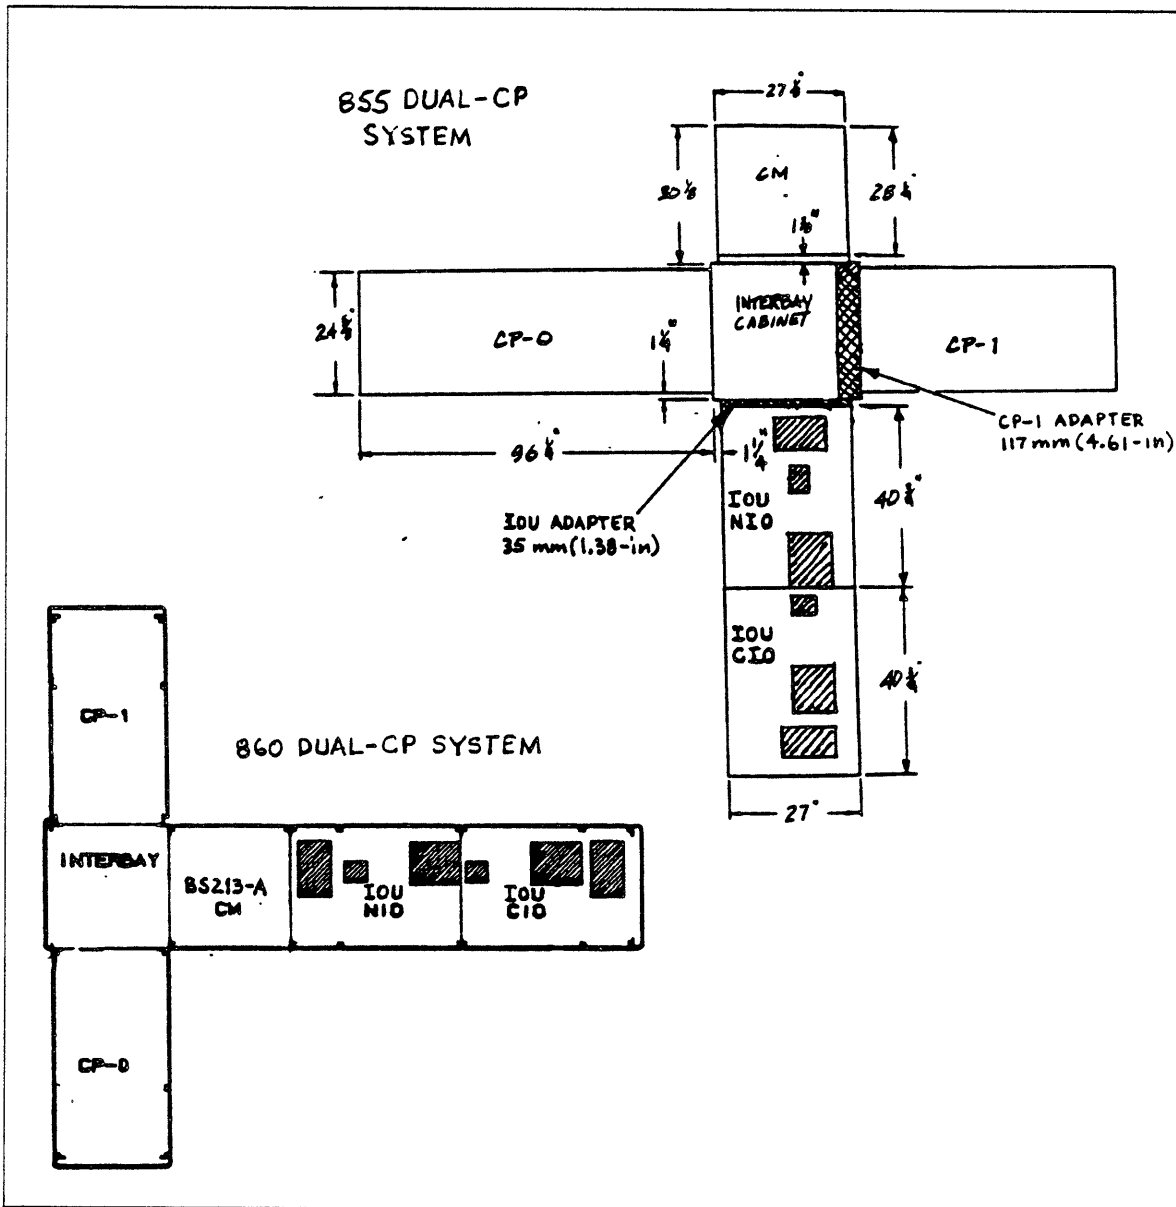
IOU NIO and CIO Floor Cutout Locations
